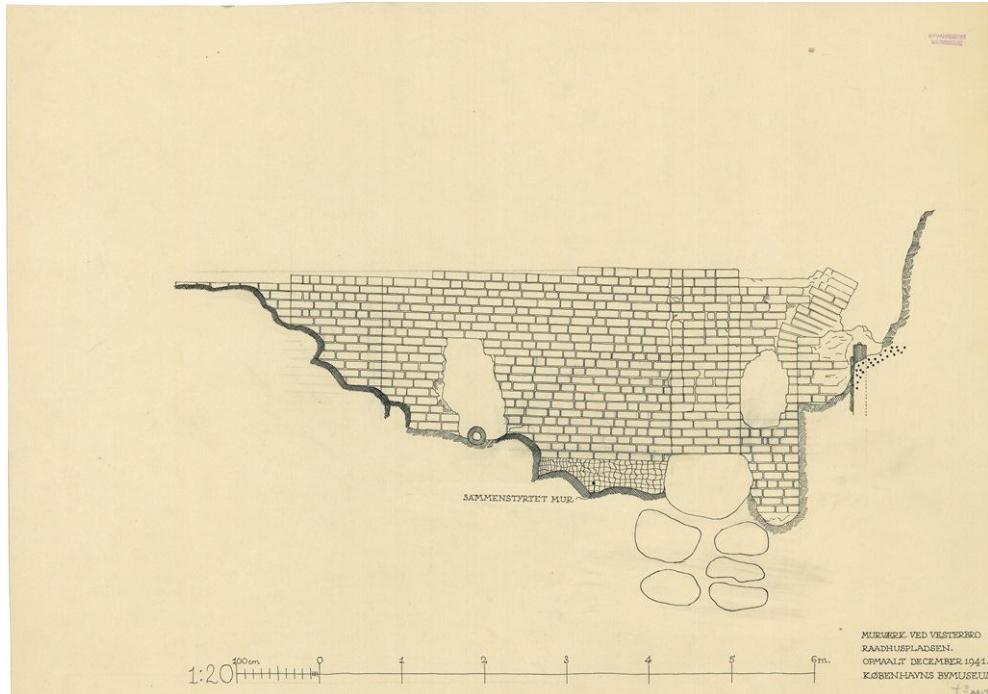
An elevation drawing of part of the brick bridge over the medieval moat made in 1941 during the toilet building construction.
